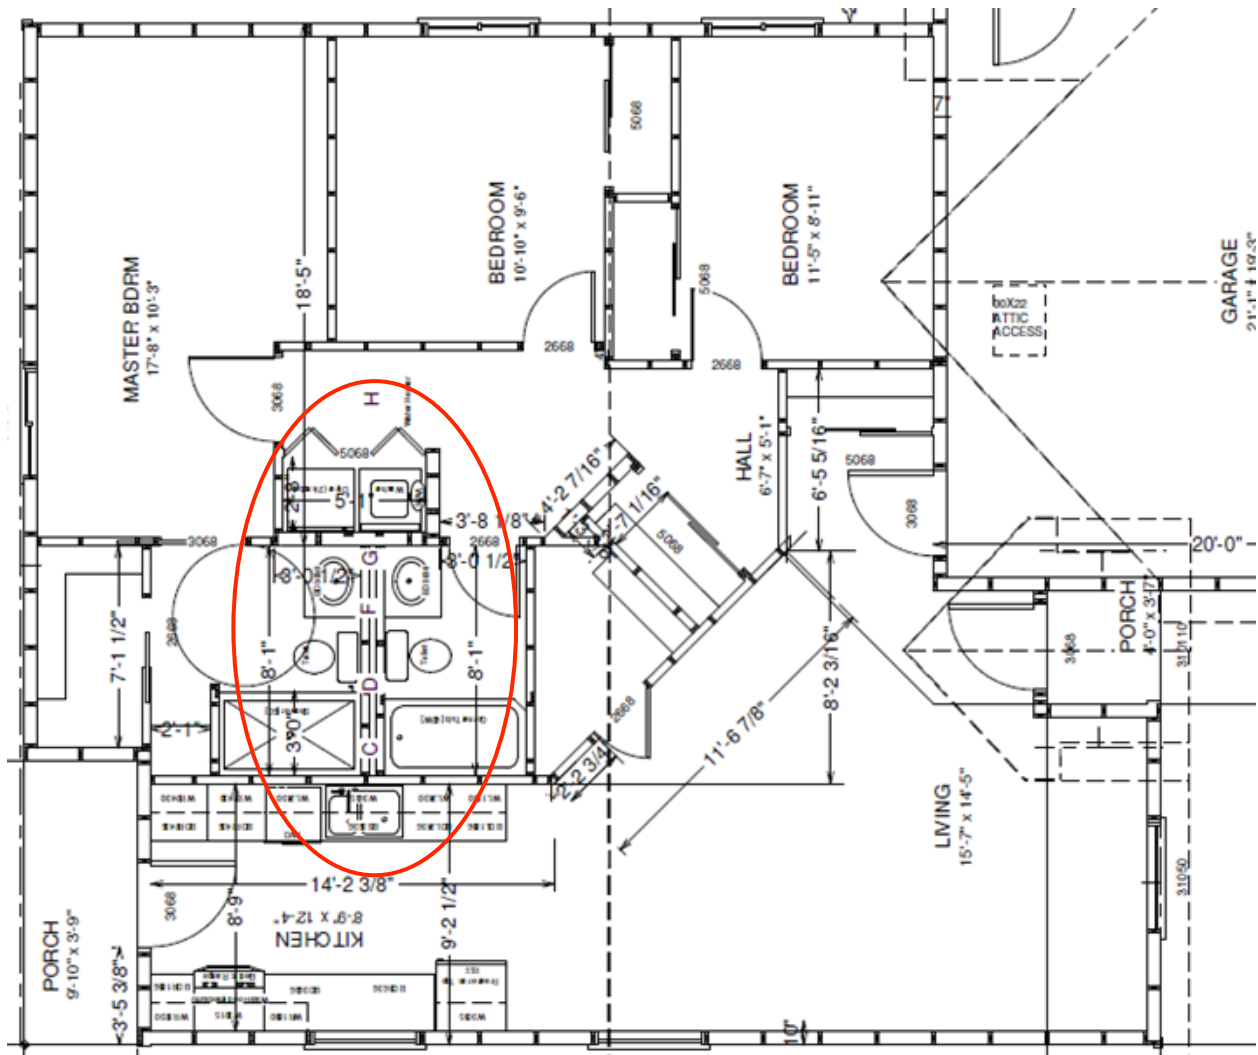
Compact Plumbing Layout (SJC Habitat)
